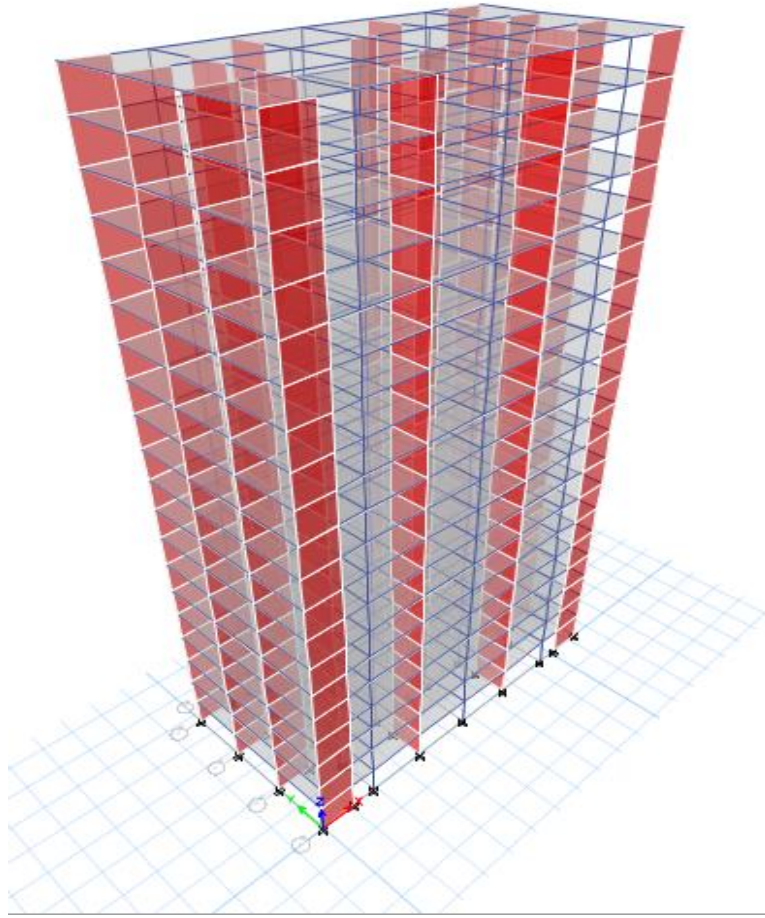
3D Structural model of 20 story building Model 1 with 20cm thick shear wall
